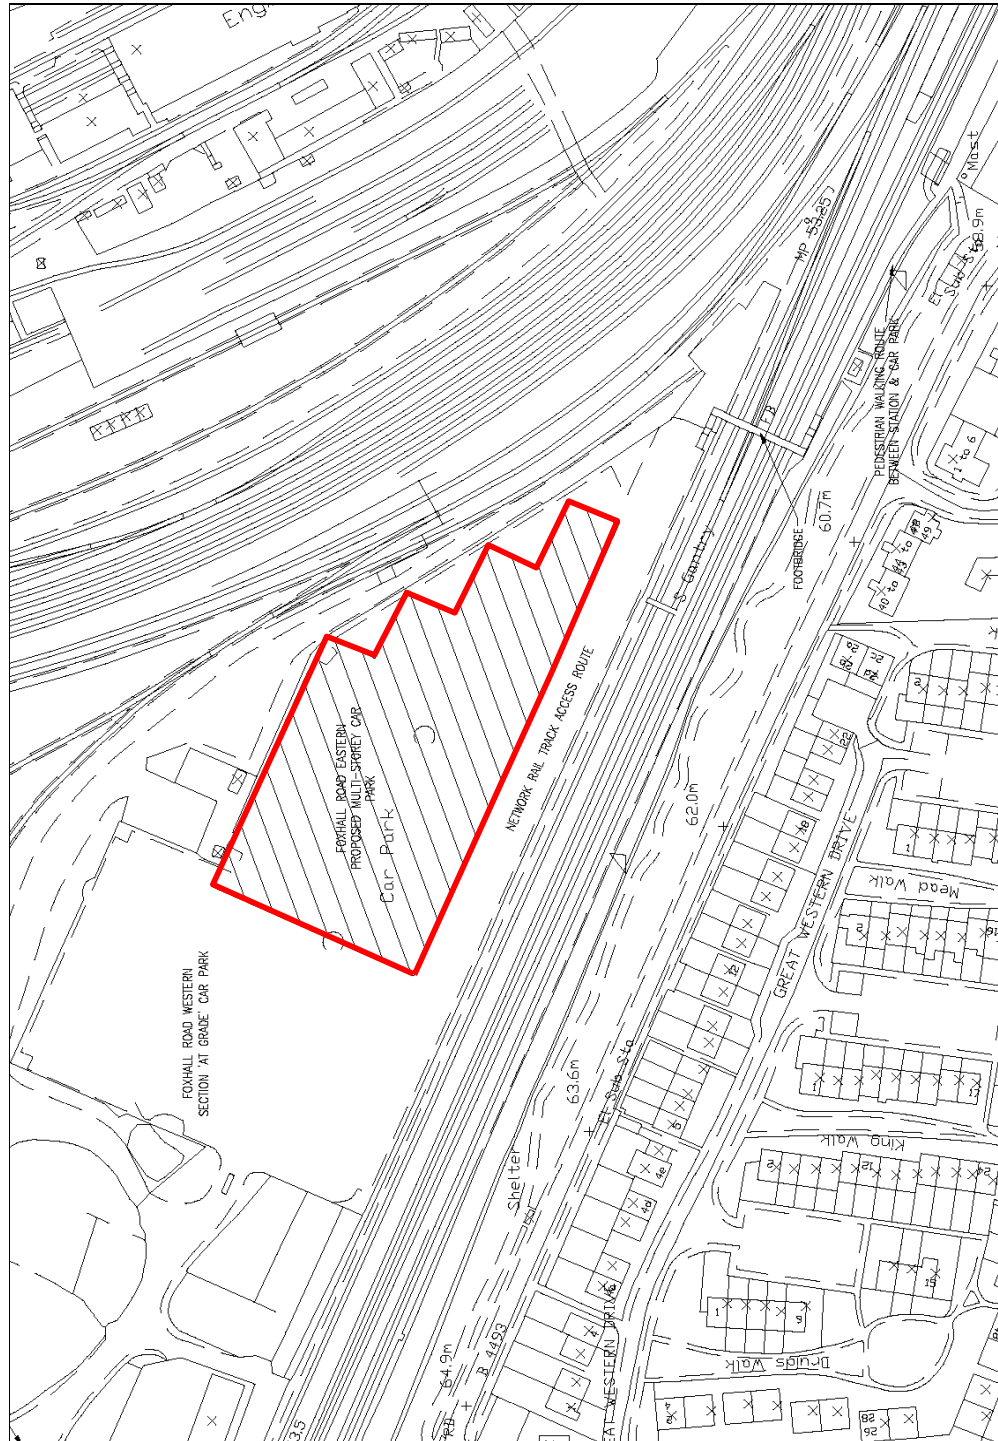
Plan of the proposed development (Scale = 1: 2,500)
